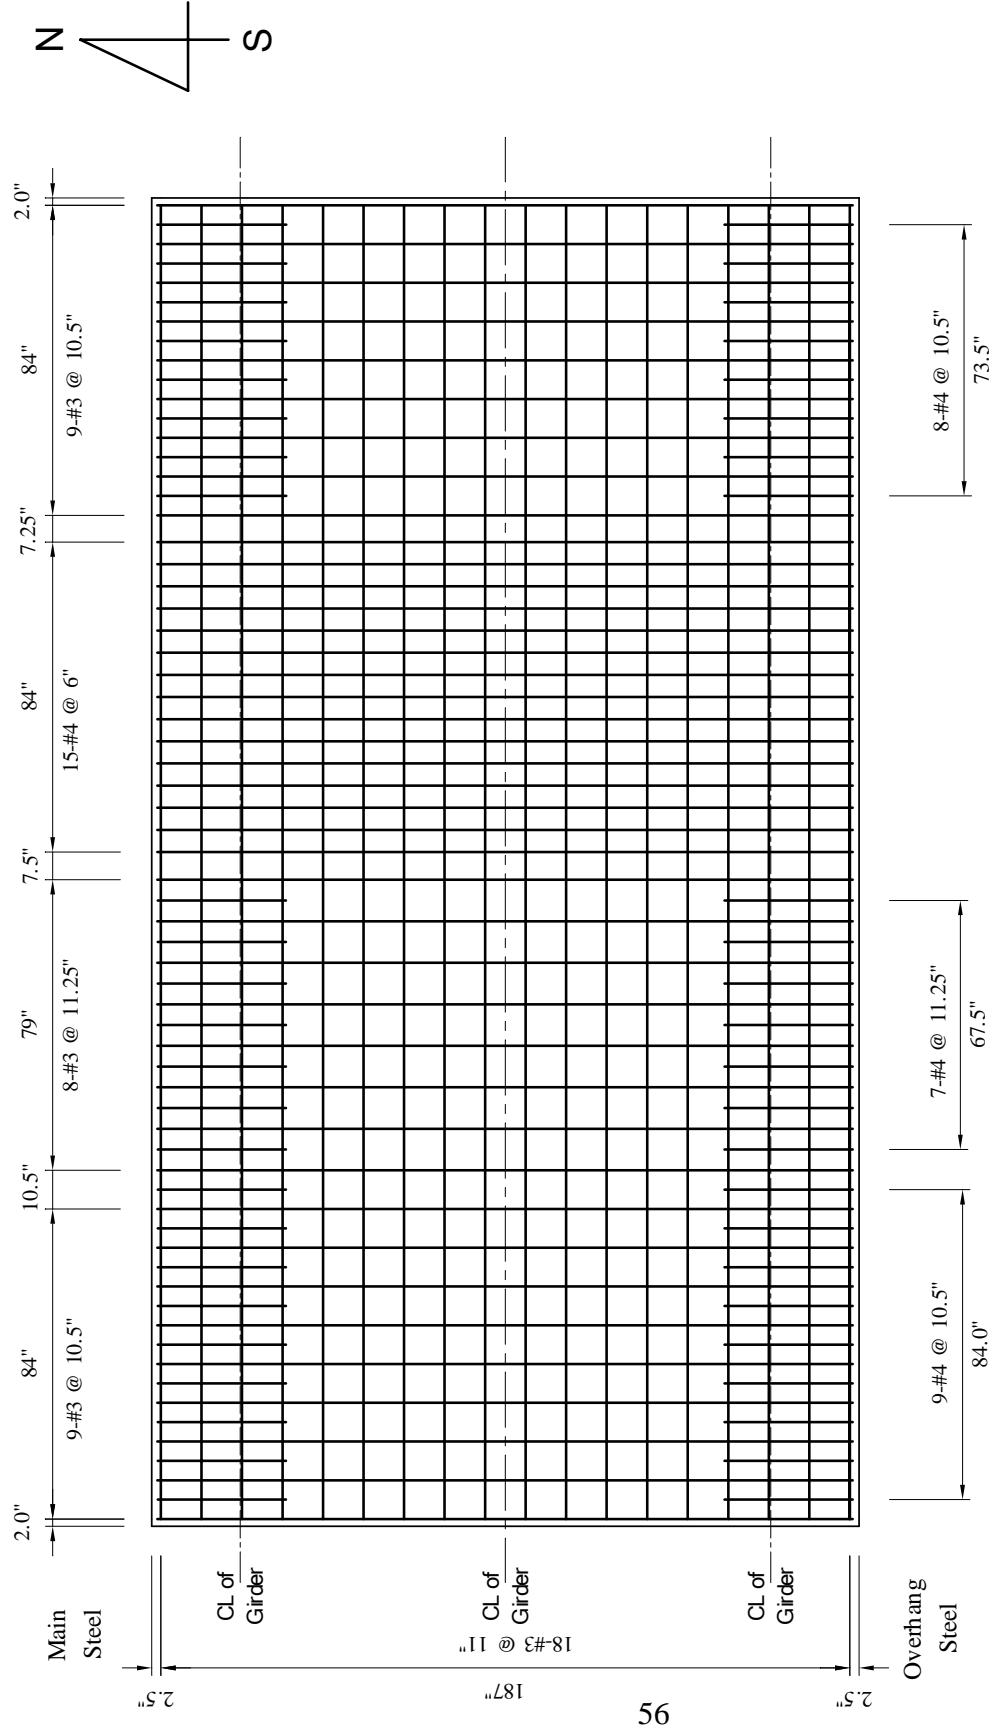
Plan View of Top Reinforcement (Support to Support only)
